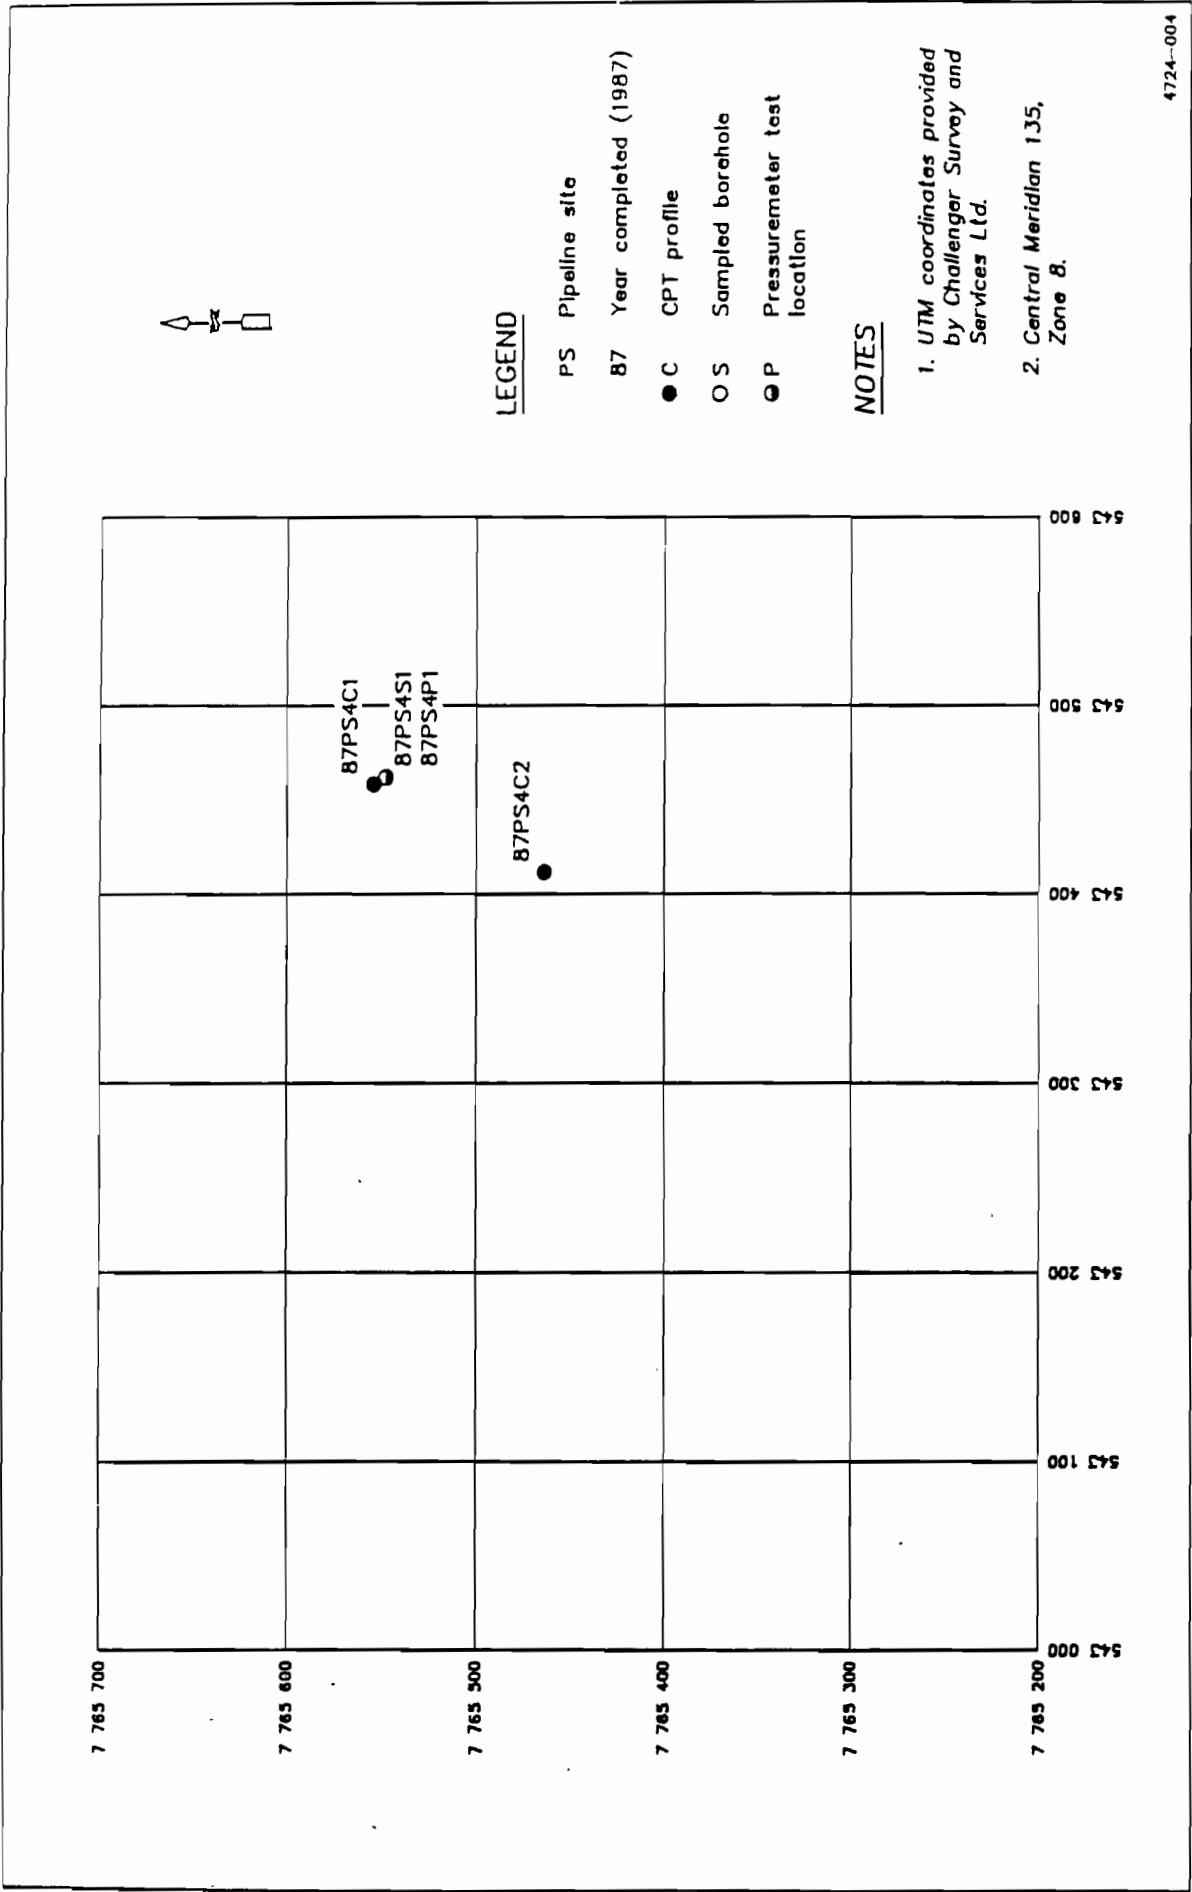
DETAILED BOREHOLE, CPT AND PRESSUREMETER LOCATIONS PROPOSED PIPELINE SITE 4
